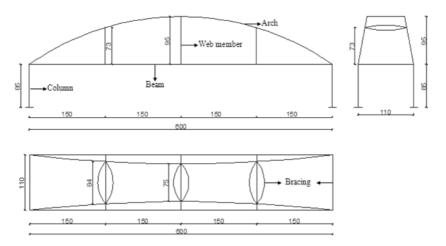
Geometrical properties of the laboratory bridge model (unit: cm)
